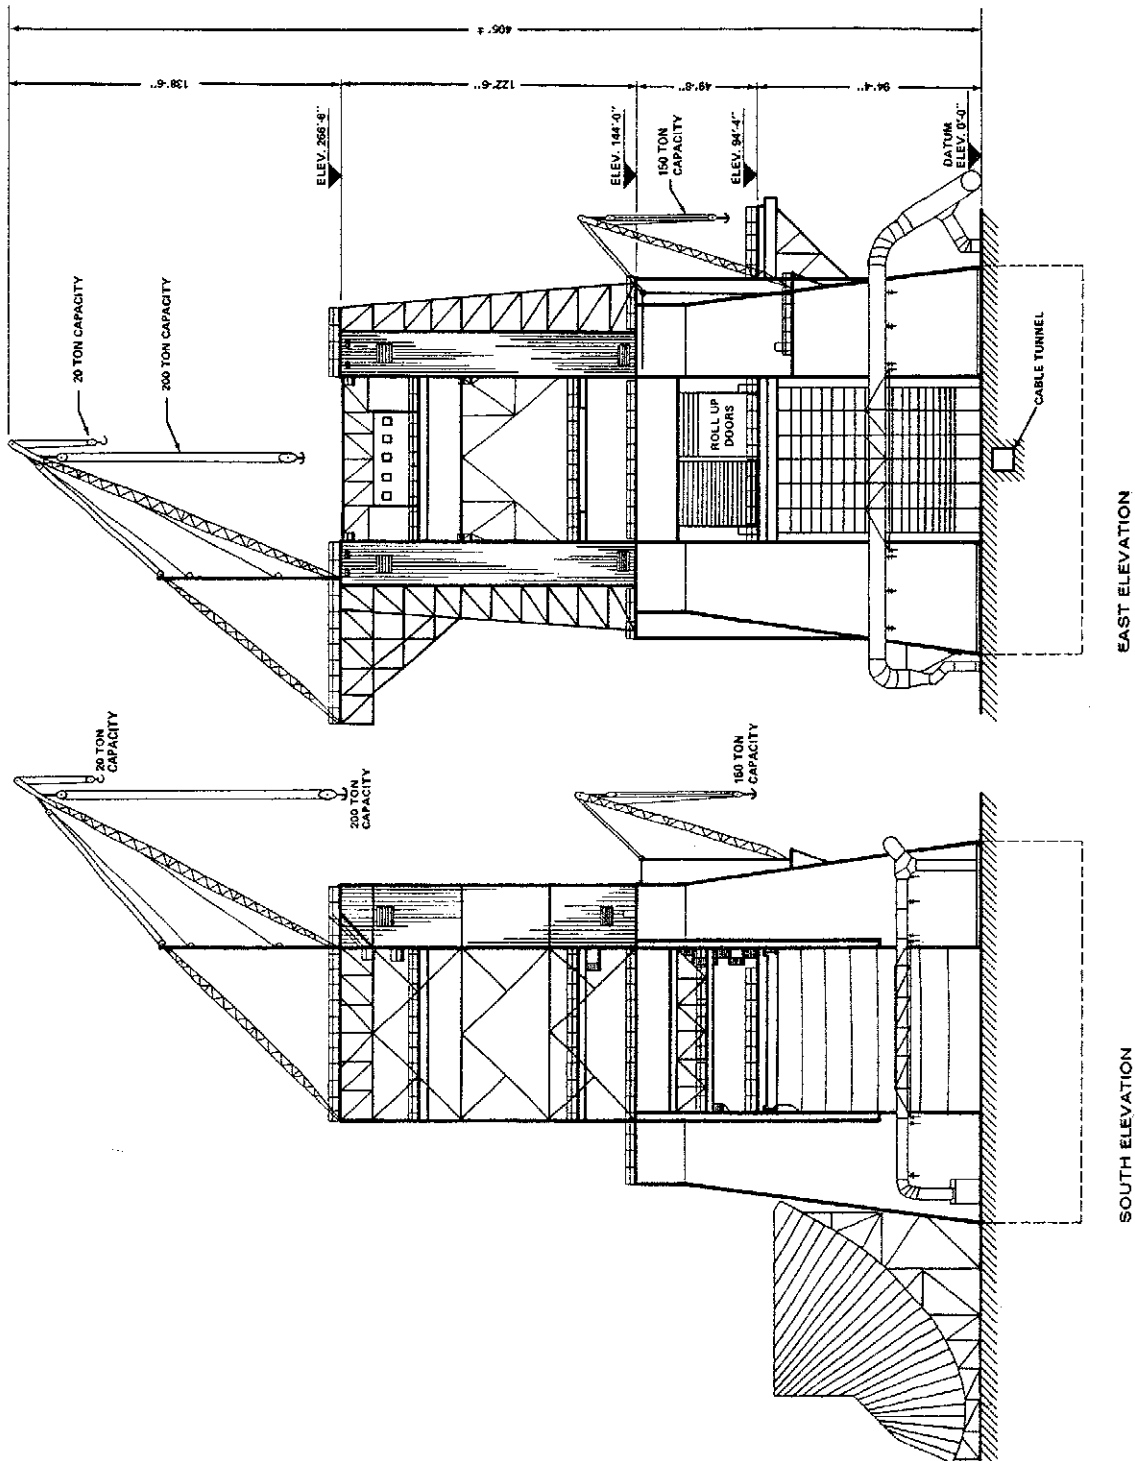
Elevation drawings of the Propulsion and Structural Test Facility (Building 4670) at NASA's Marshall Space Flight Center. (Source: Master Planning Office, Marshall Space Flight Center)
